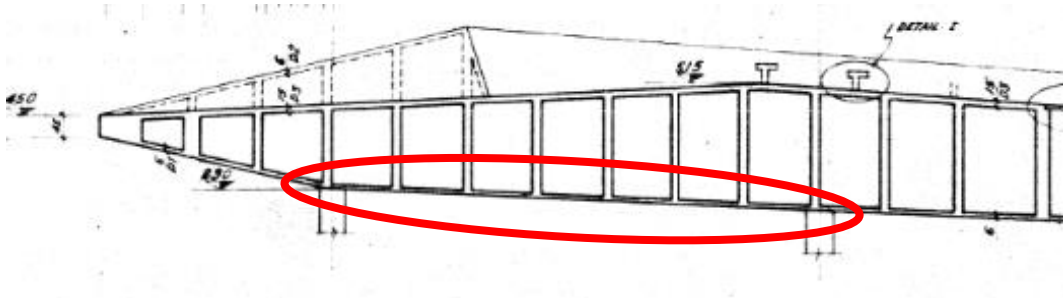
Partial section through OAT showing top and bottom slab with regularly spaced beams (Darr el Handasah Consulting Engineers, C308, Revision 4, June 1969)
